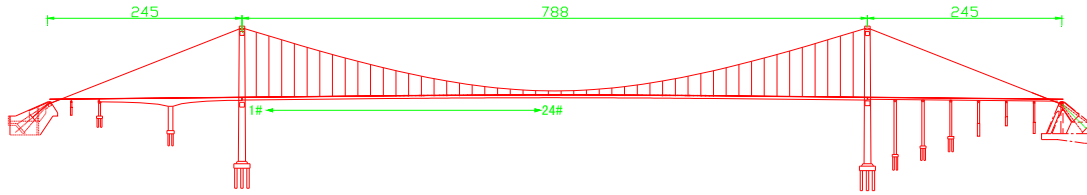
General arrangement diagram of Qingcaobei Yangtze river bridge (Unit: m)
